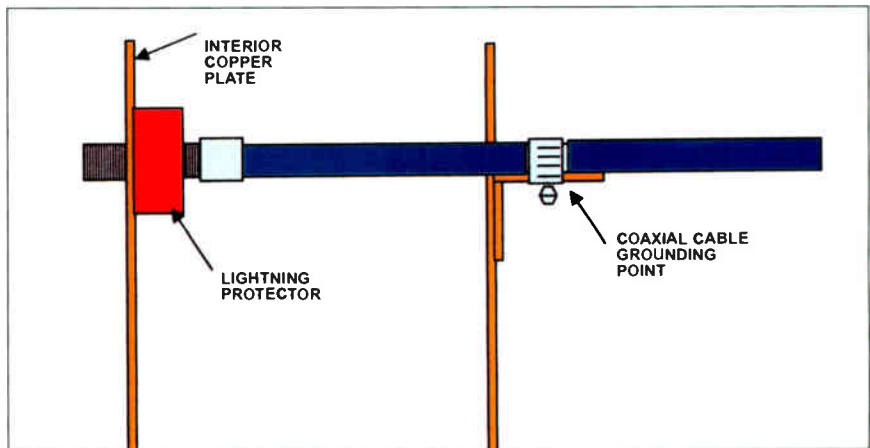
Coaxial cable entering the shelter is grounded at the outside plate and connected at the inside plate to a lightning surge protector.
